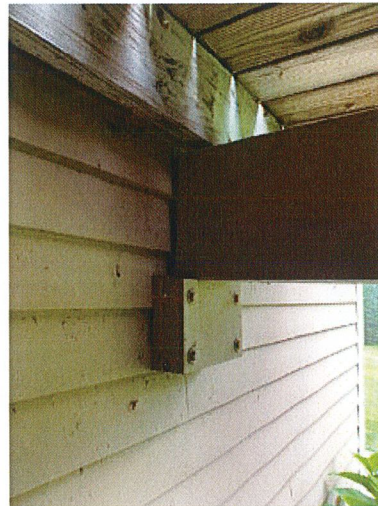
Substandard support for the deck beam. Recommend further review and repairs by upgrading support by a qualified contractor. Additional bracing should be considered as well where needed to prevent rolling of the outer deck beam.
